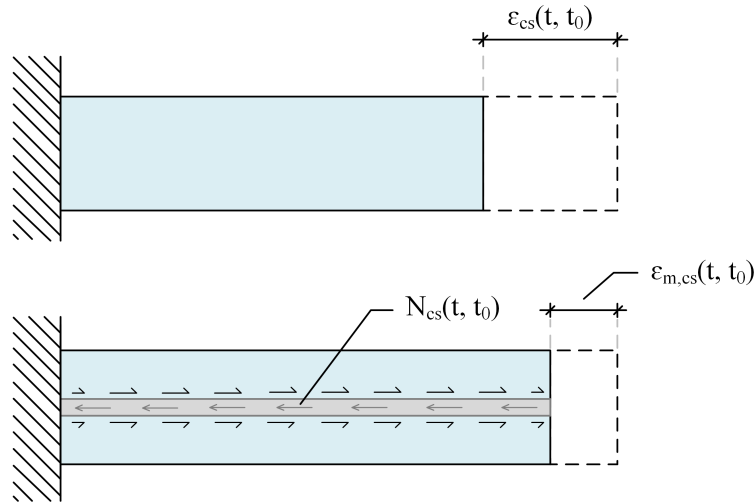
Reinforcing steel resisting the shrinkage of concrete
